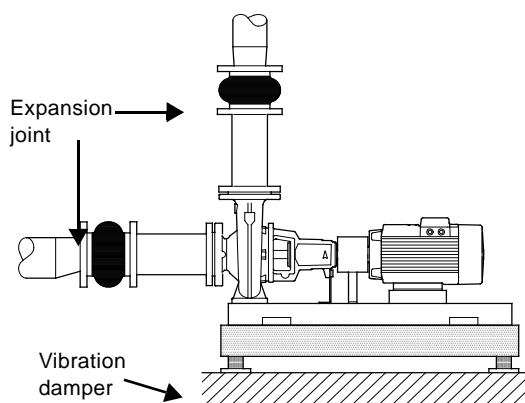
NK, NKE pump with expansion joints and vibration dampers
